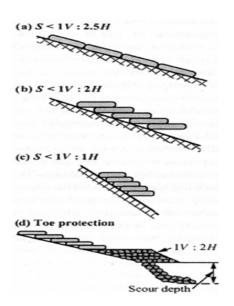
Blocks made of concrete are used to cover the surface of unstable soil to control erosion. The blocks have openings to provide for drainage and allow vegetation to grow
